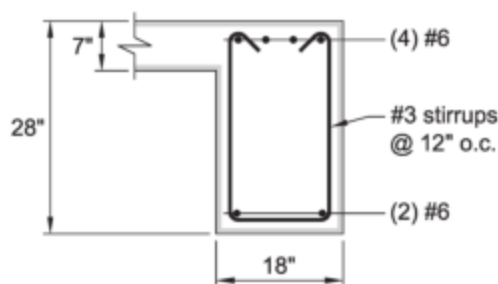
Section A-A through Beam B1 near connection with Beam B2.
